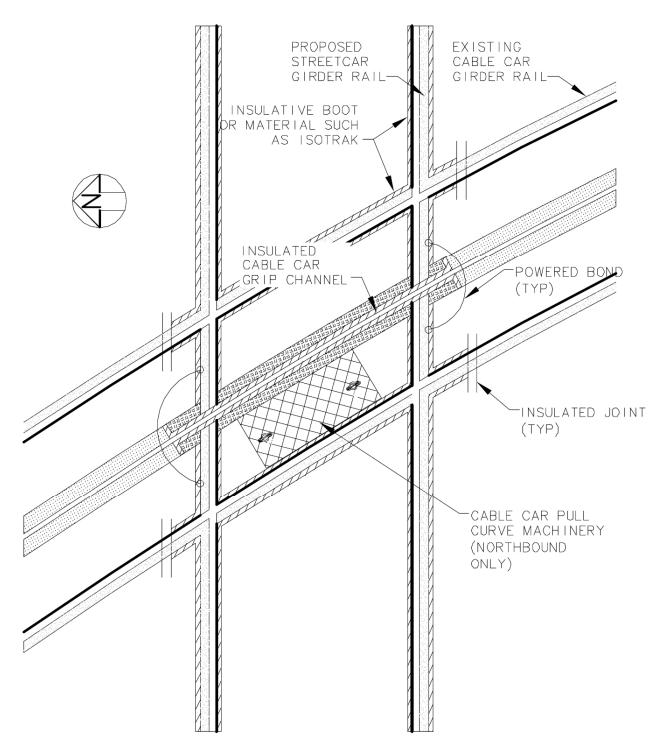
Typical Cable Car Crossing at Beach and Hyde Street
